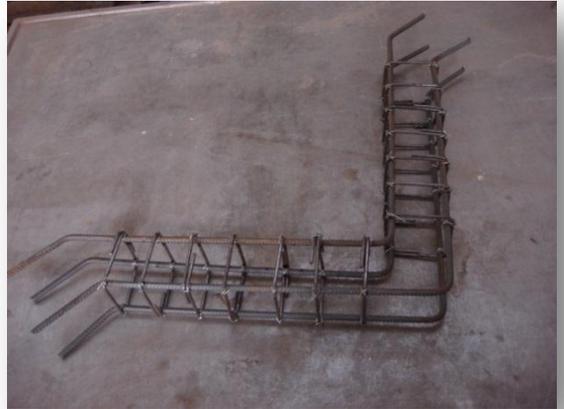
, Corner Set up Figure (3).Concrete corner reinforcement
